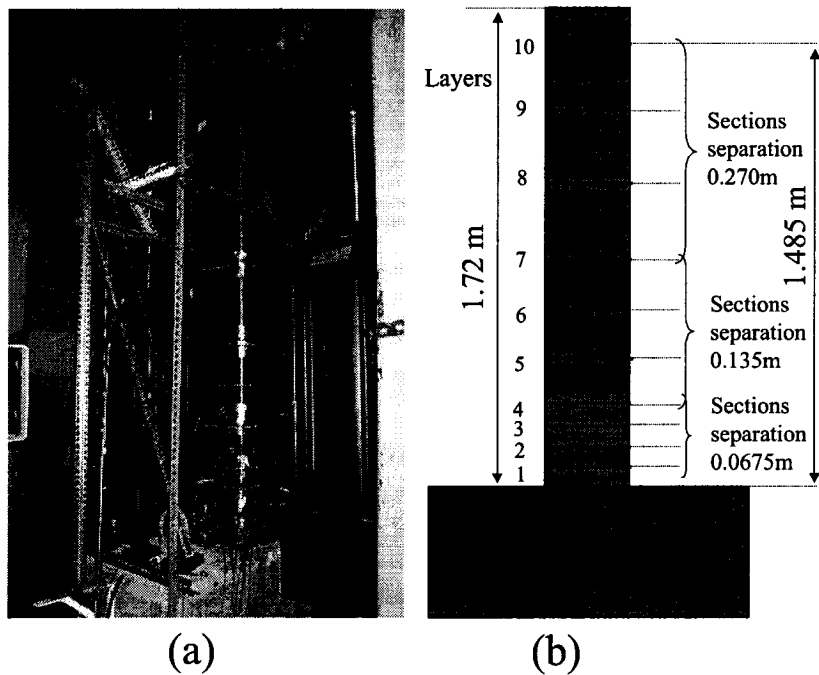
(a) Instrumented FRP/concrete column in test set-up; (b) Column dimensions and fibre optic layout (Ravet 2006, Ravet 2007)
